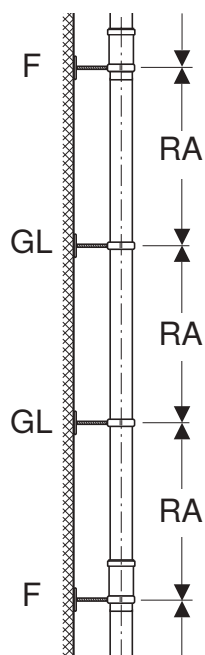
Pipe bracket spacing RA for vertical wall fastening
